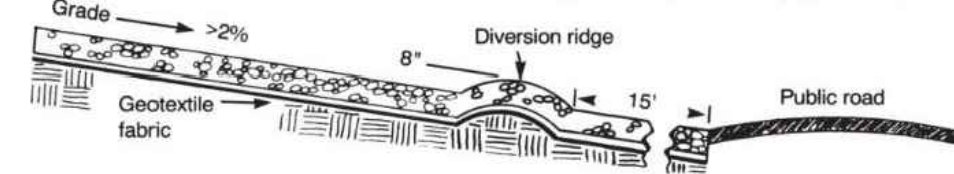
Temporary gravel construction entrance/exit with diversion ridge where grade exceeds 2%.
